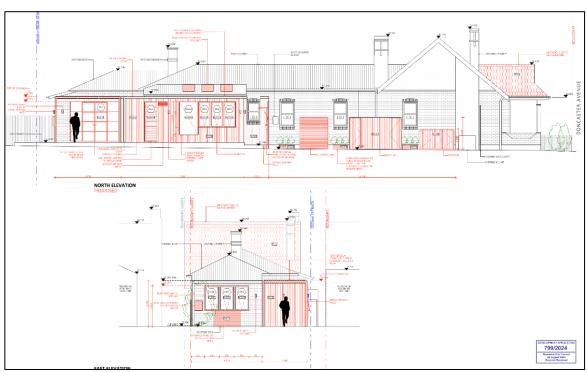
Extract of proposed North and East Elevation Plan (Source: B Studio).
